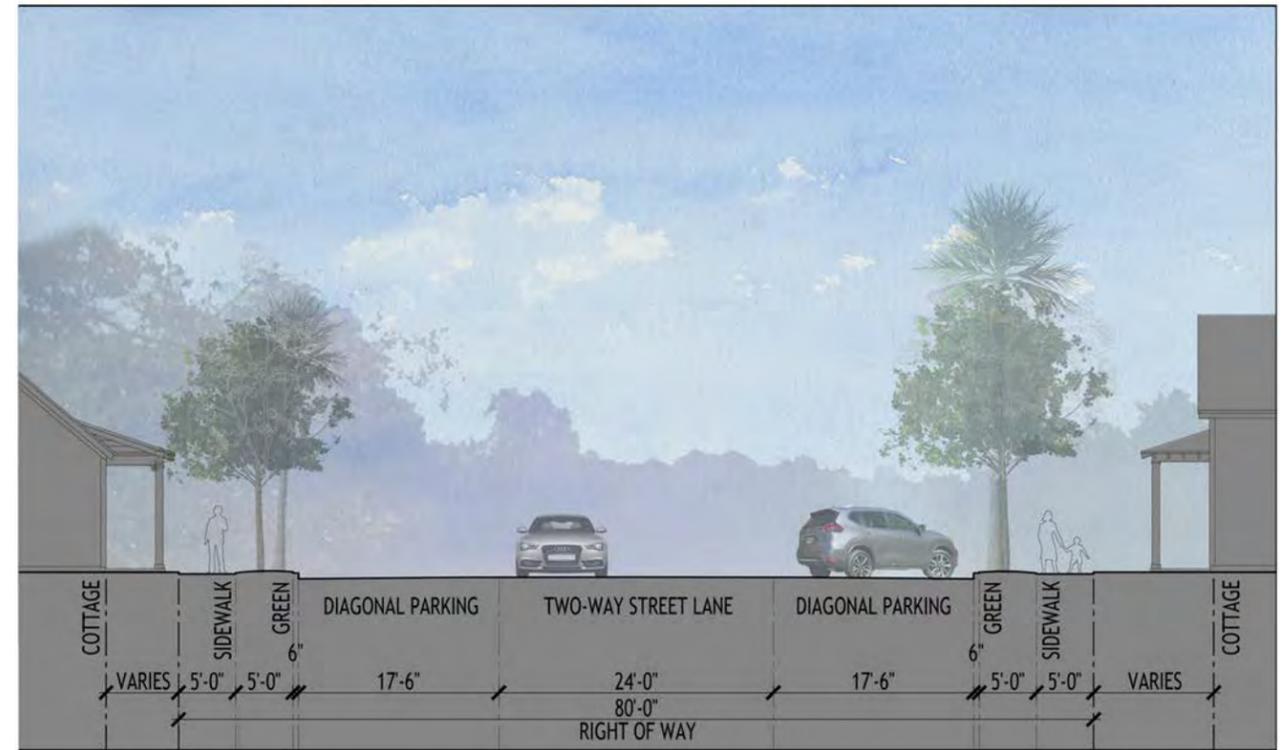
EXHIBIT H: TYPICAL STREET SECTION & PLAN VIEW
